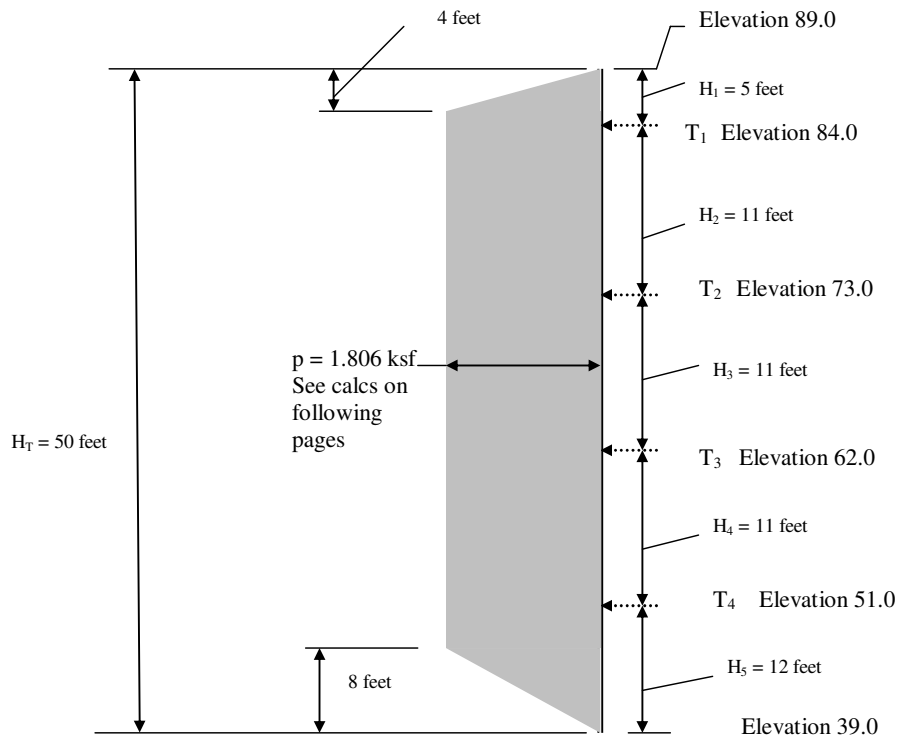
Apparent pressure and surcharge loading on Bonneville tieback wall
